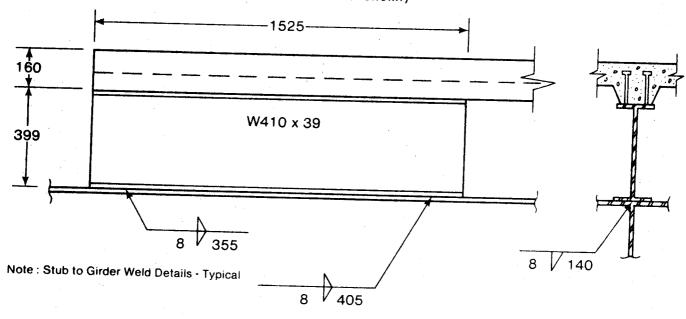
Cross Section of a Typical Stub Specimen (stiffeners are not shown)
